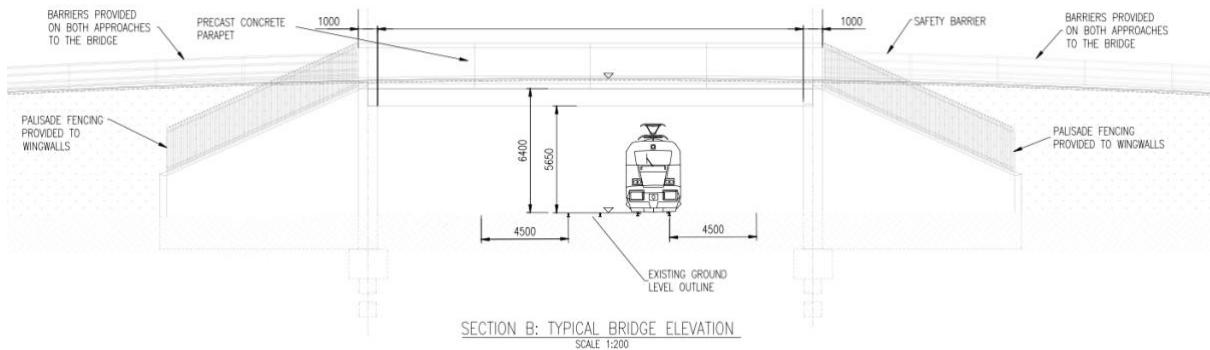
Typical Bridge Elevation (extract from Drawing No. P152 'Dunboyne Southern Distributor Road Longitudinal Section), prepared by Waterman Moylan Consulting Engineers
